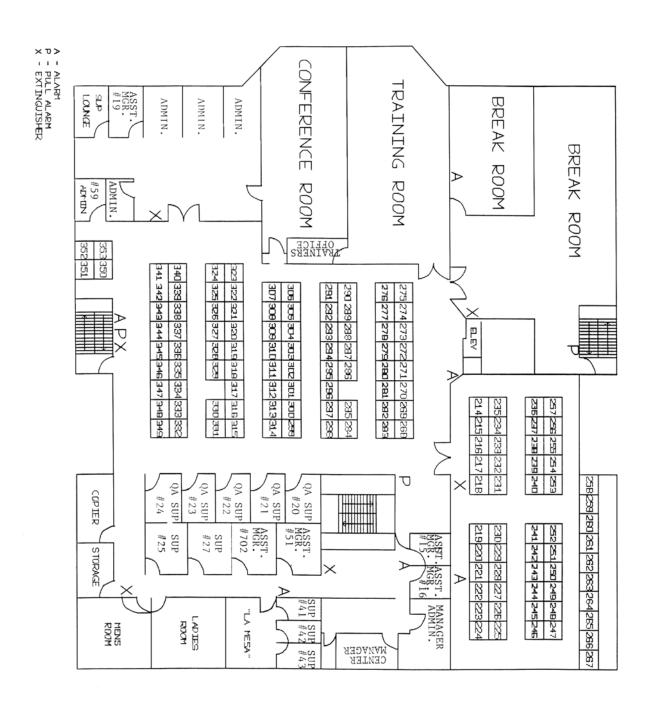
<sup>2nd</sup> Floor Plan for the Dallas Reservations Center HETA 00-0088 Southwest Airlines Dallas Reservations Center, Grand Prairie, TX December 27-29, 1999
